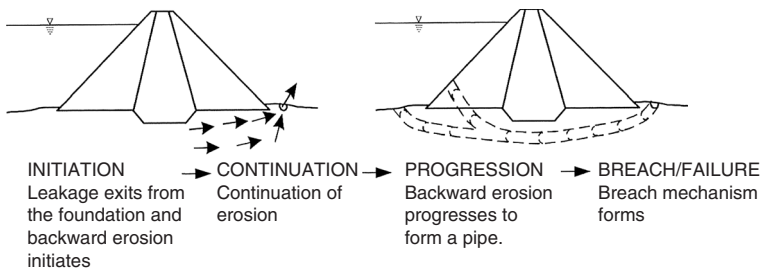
Conceptual model for development of failure by piping in the foundation (after [15]).
